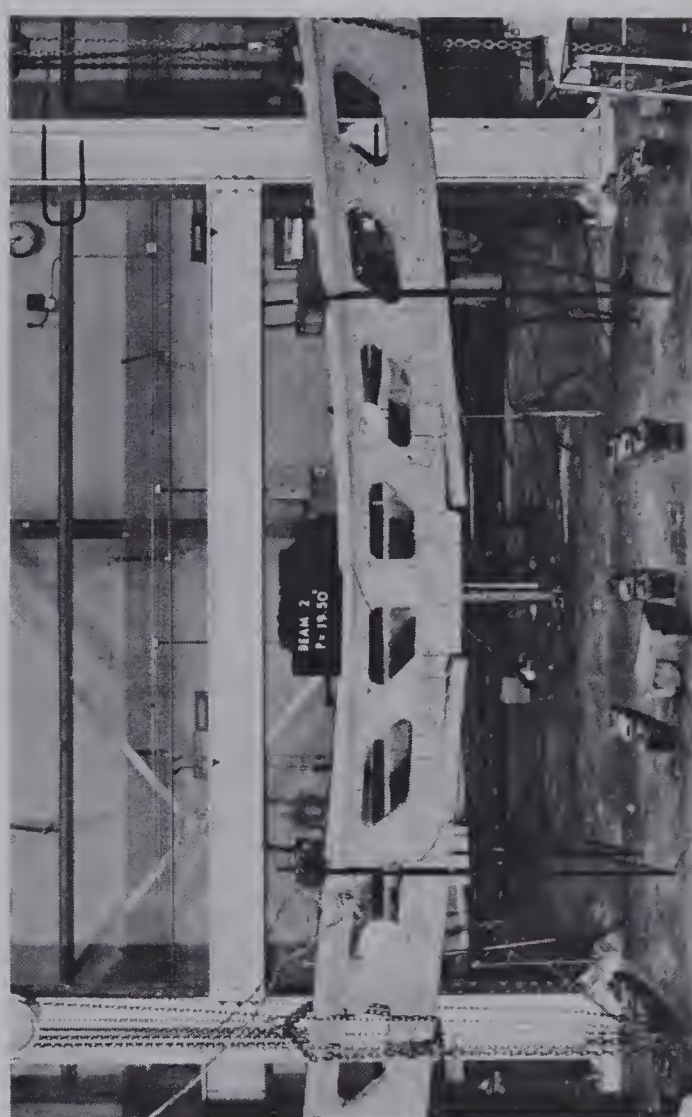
(b) CRACKING AND FAILURE PATTERNS, BEAM 2
